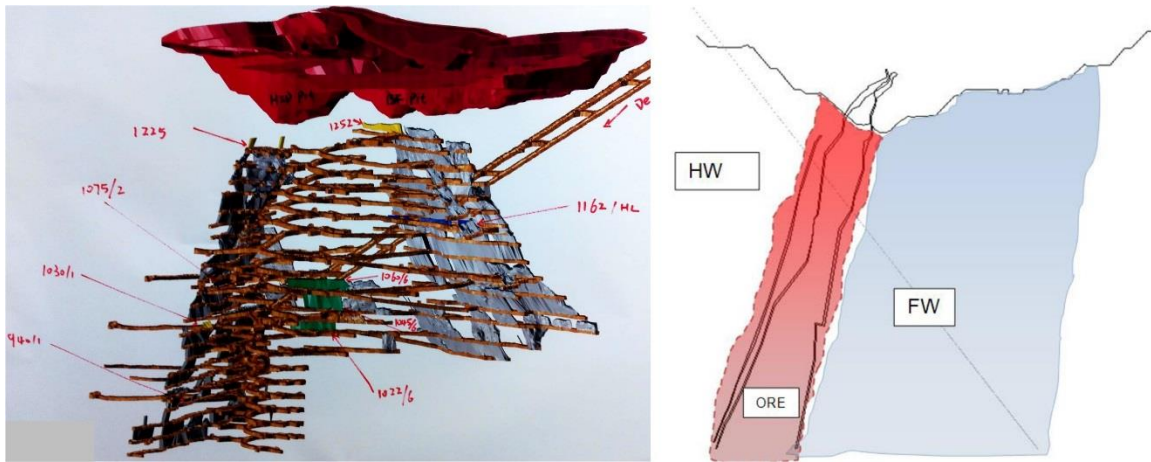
Left; Underground gold mine layout, and Right; geological structure of orebody and hanging and footwall.
